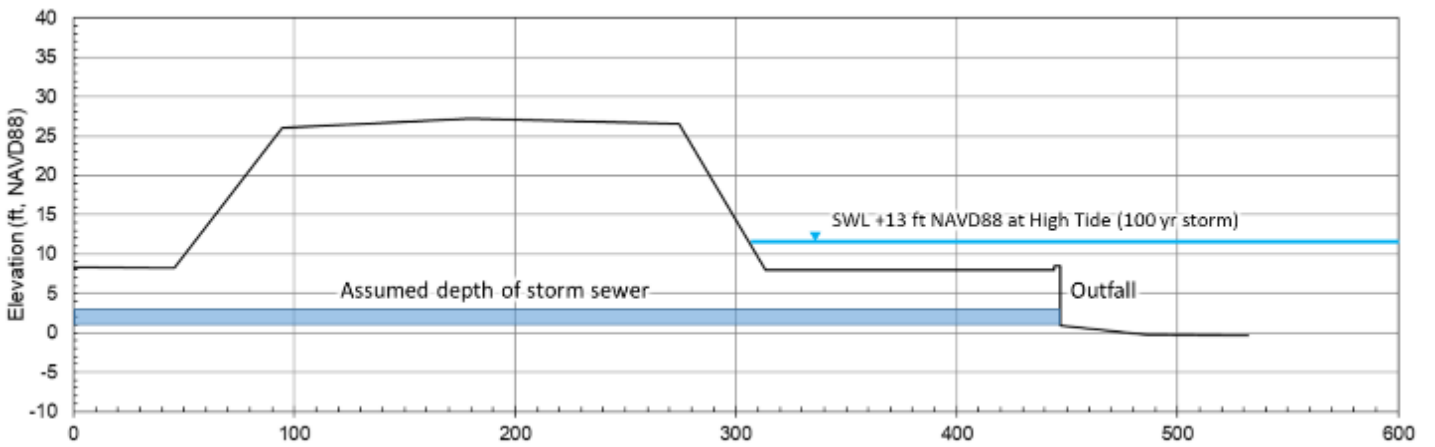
Storm sewer outfall near Long Wharf Drive Bridge under I-95 embankment (other outfalls similar)
